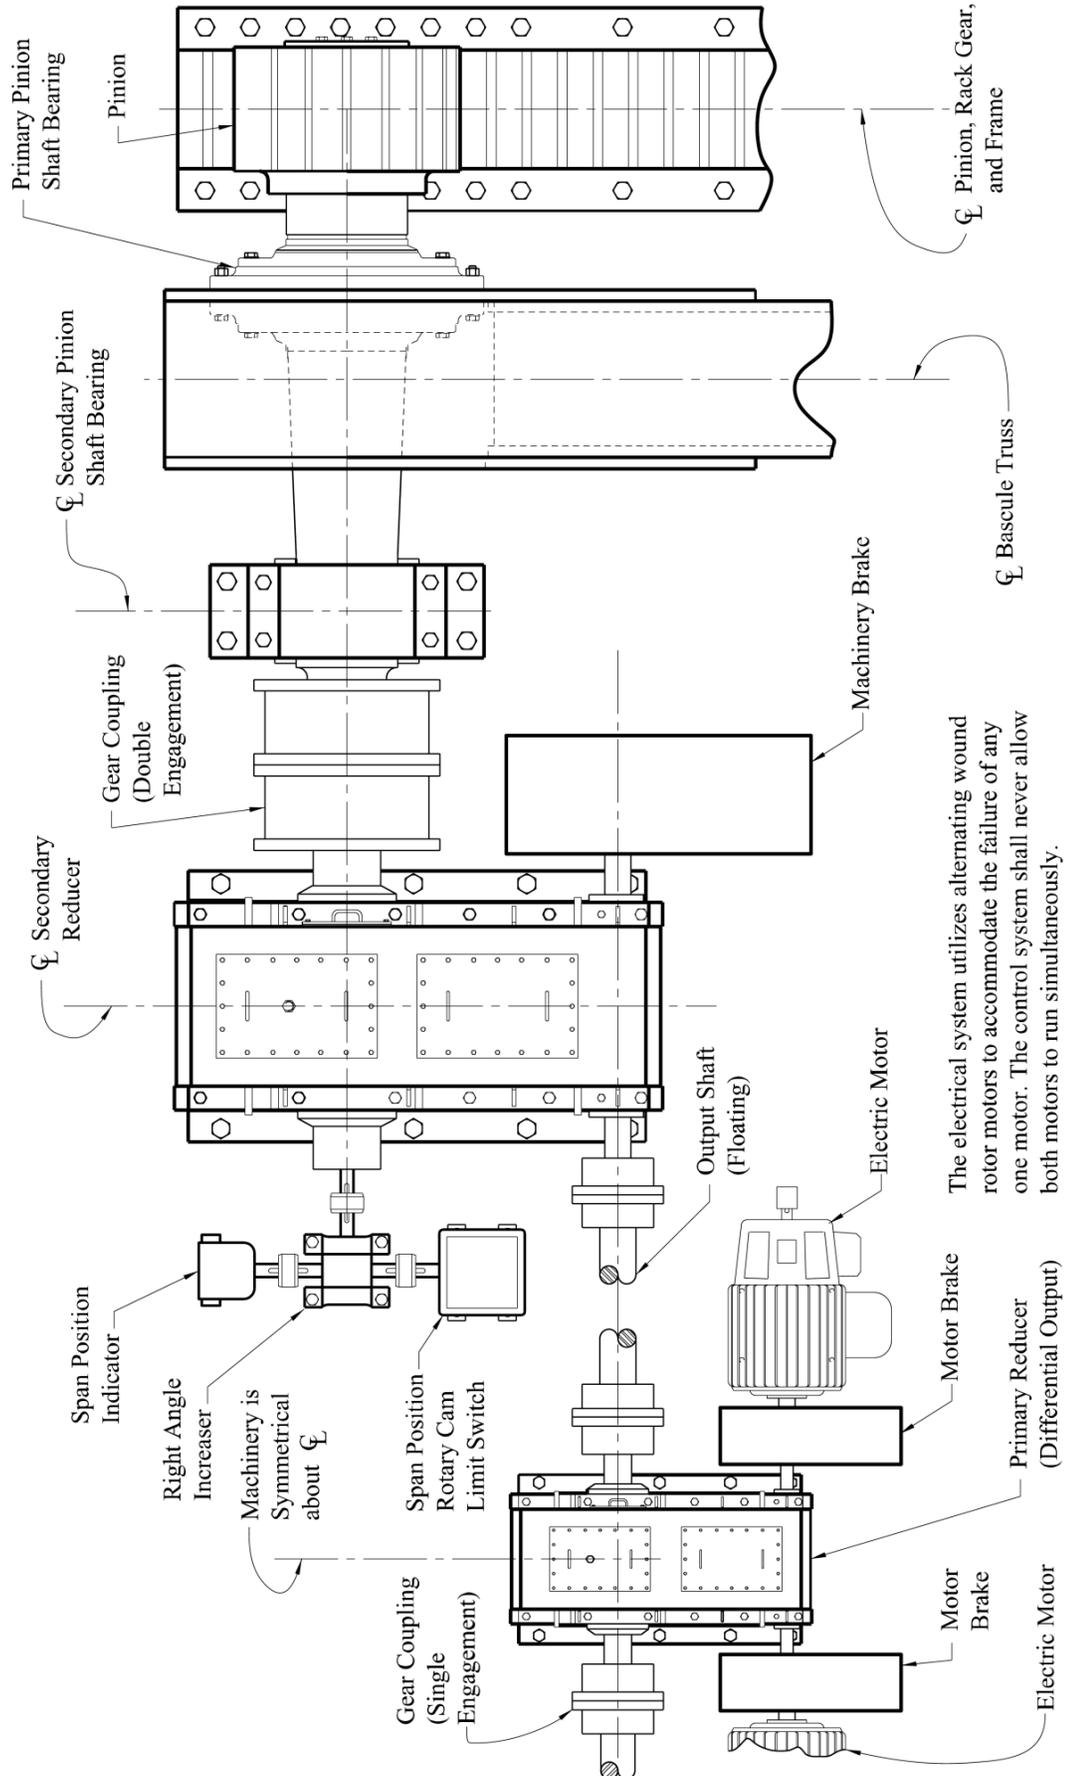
Span Drive Machinery Layout for a Rolling Lift Bascule Bridge
